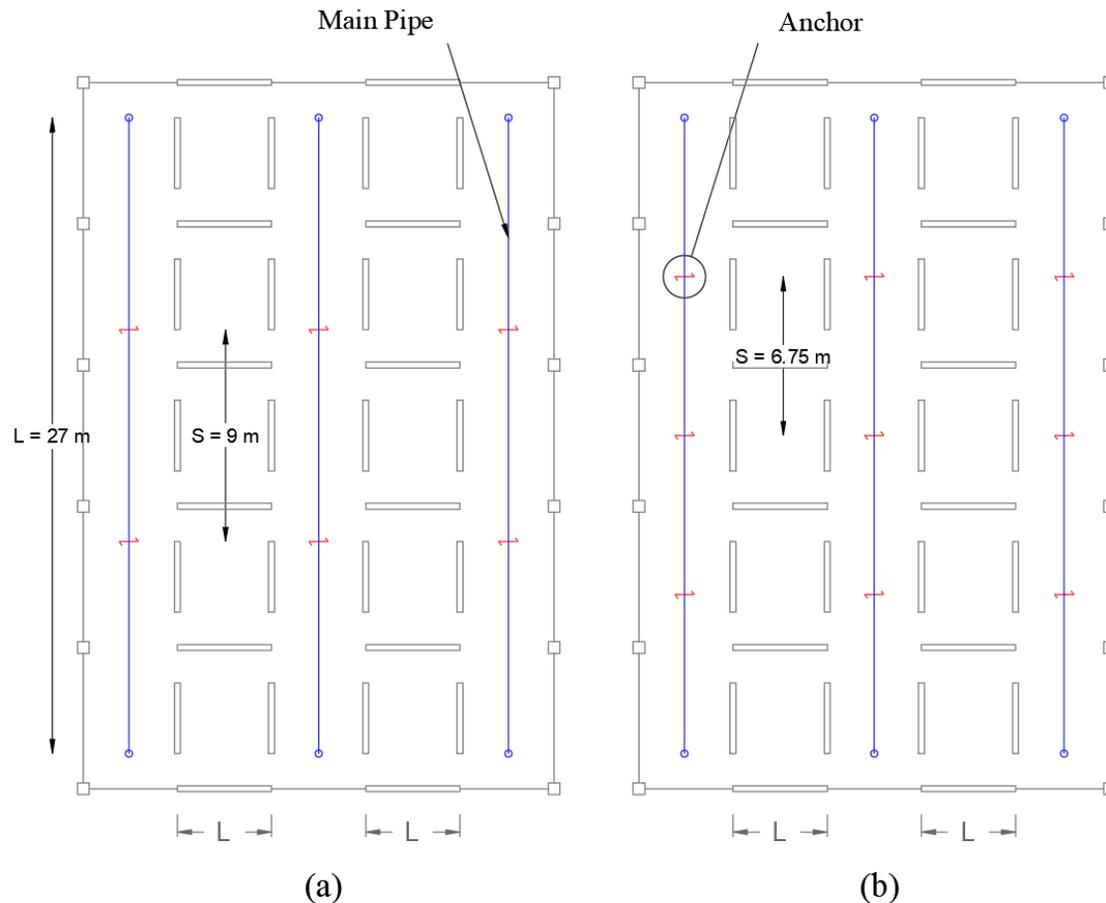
Plan view of the design of anchors in pipes according to (a) DBF and (b) DBDD for building 02 (4 storeys)
